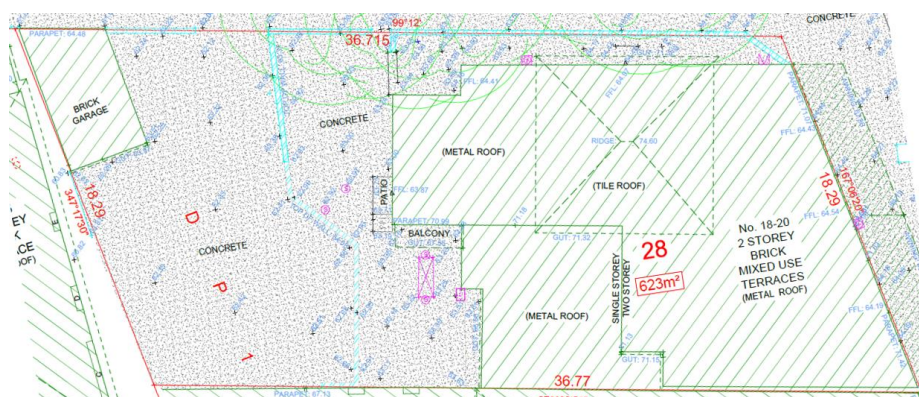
Current survey plan - 18-20A Perouse Road, Randwick (Source: Daw & Walton Consulting Surveyors)
